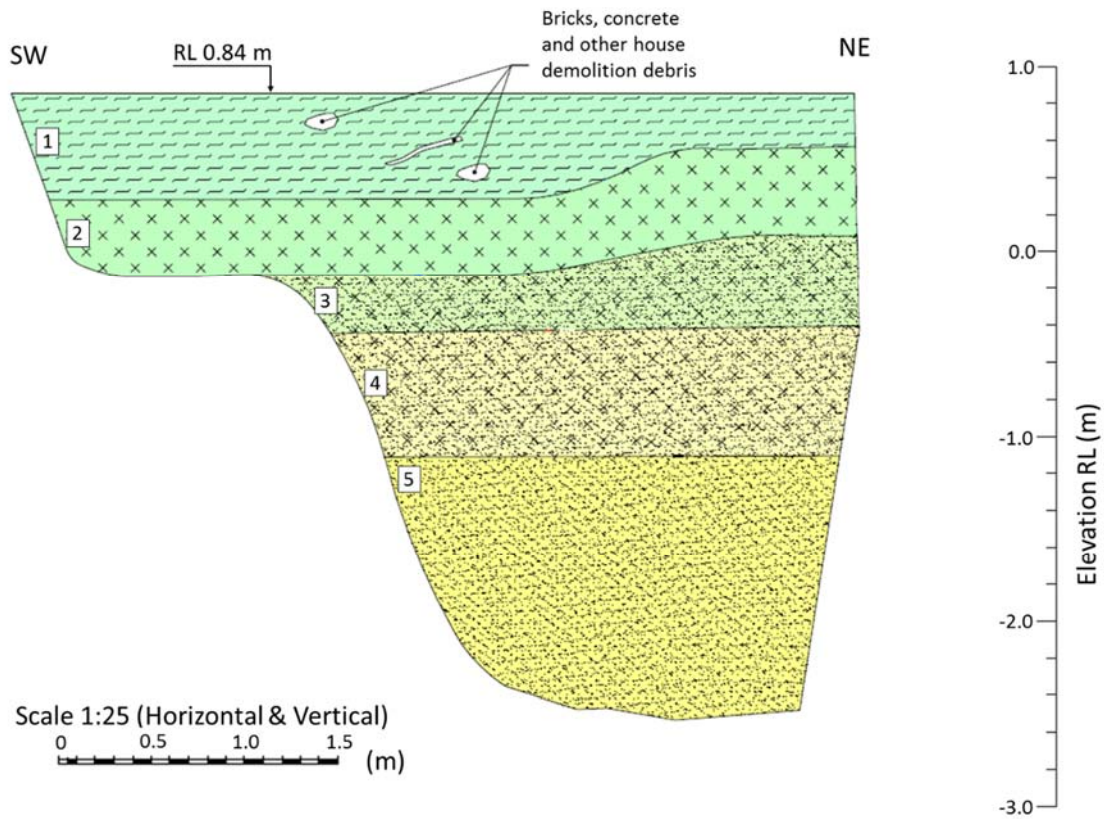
Cross-section of excavation trench at the 6-NS-2 Test Panel. Modified from van Ballegooy et al. 2017.
